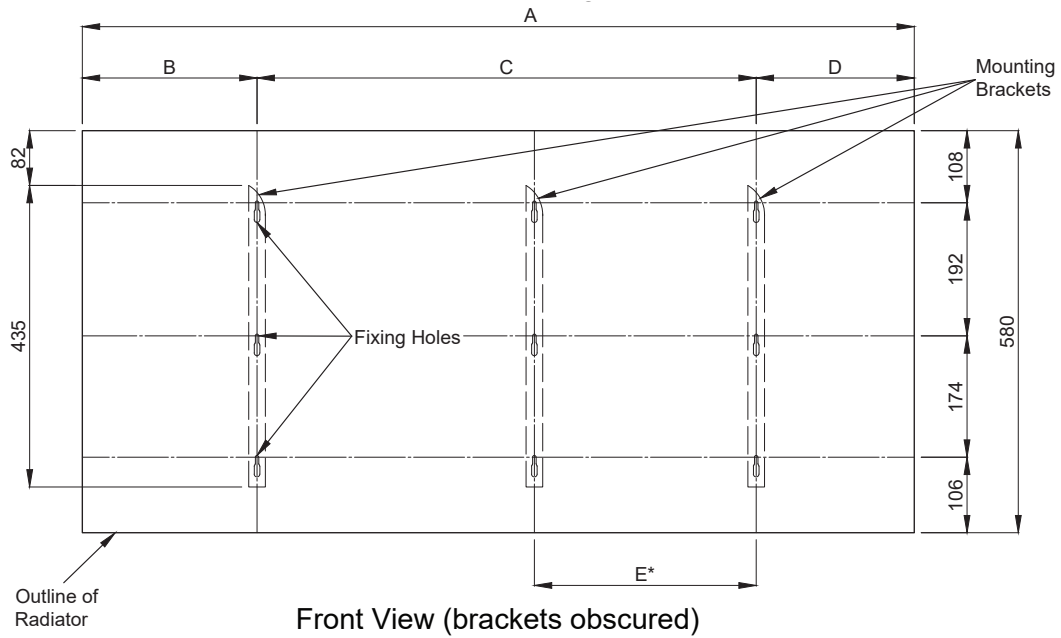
Fixing hole positions for Horizontal 580mm high radiators
